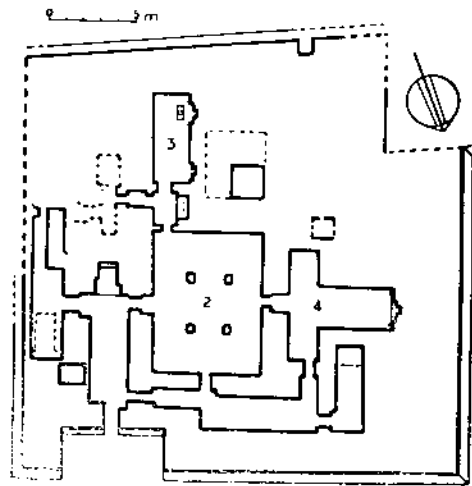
Plan of the superstructure of the mastaba of Ptahhetep and Akhethetep (Saqqara).
